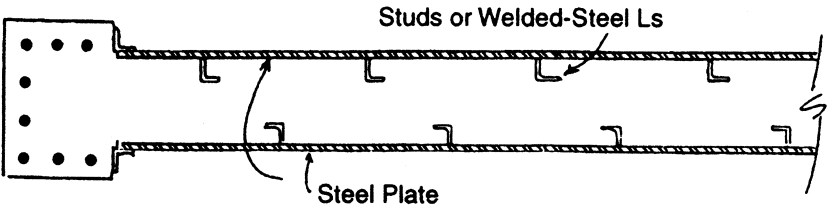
Concrete filled composite shear wall with two steel plates.
